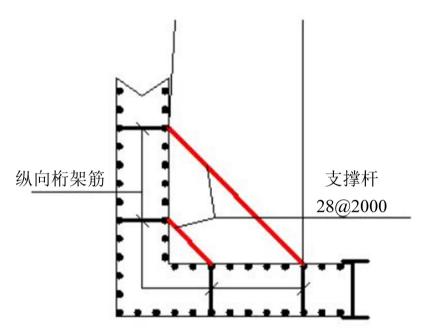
Reinforcement of L-shaped reinforcement cage 图 14. "L"形钢筋笼加固立面
